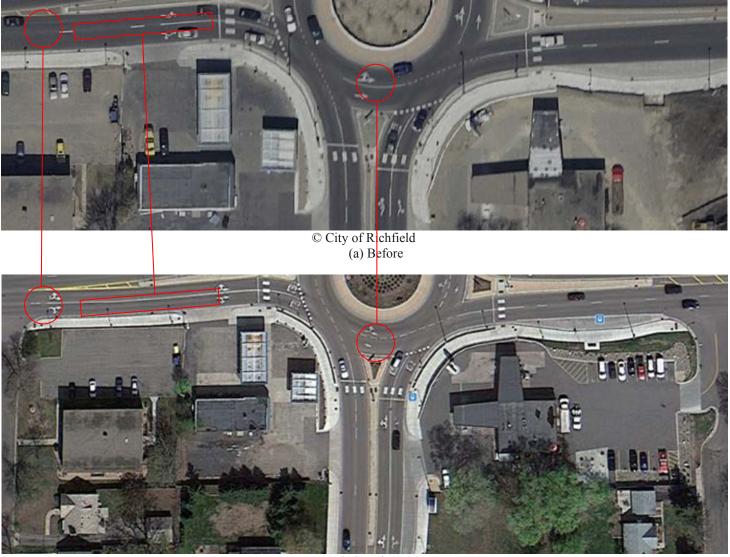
Pavement Marking Proposed Modifications. ©MTJ Engineering
